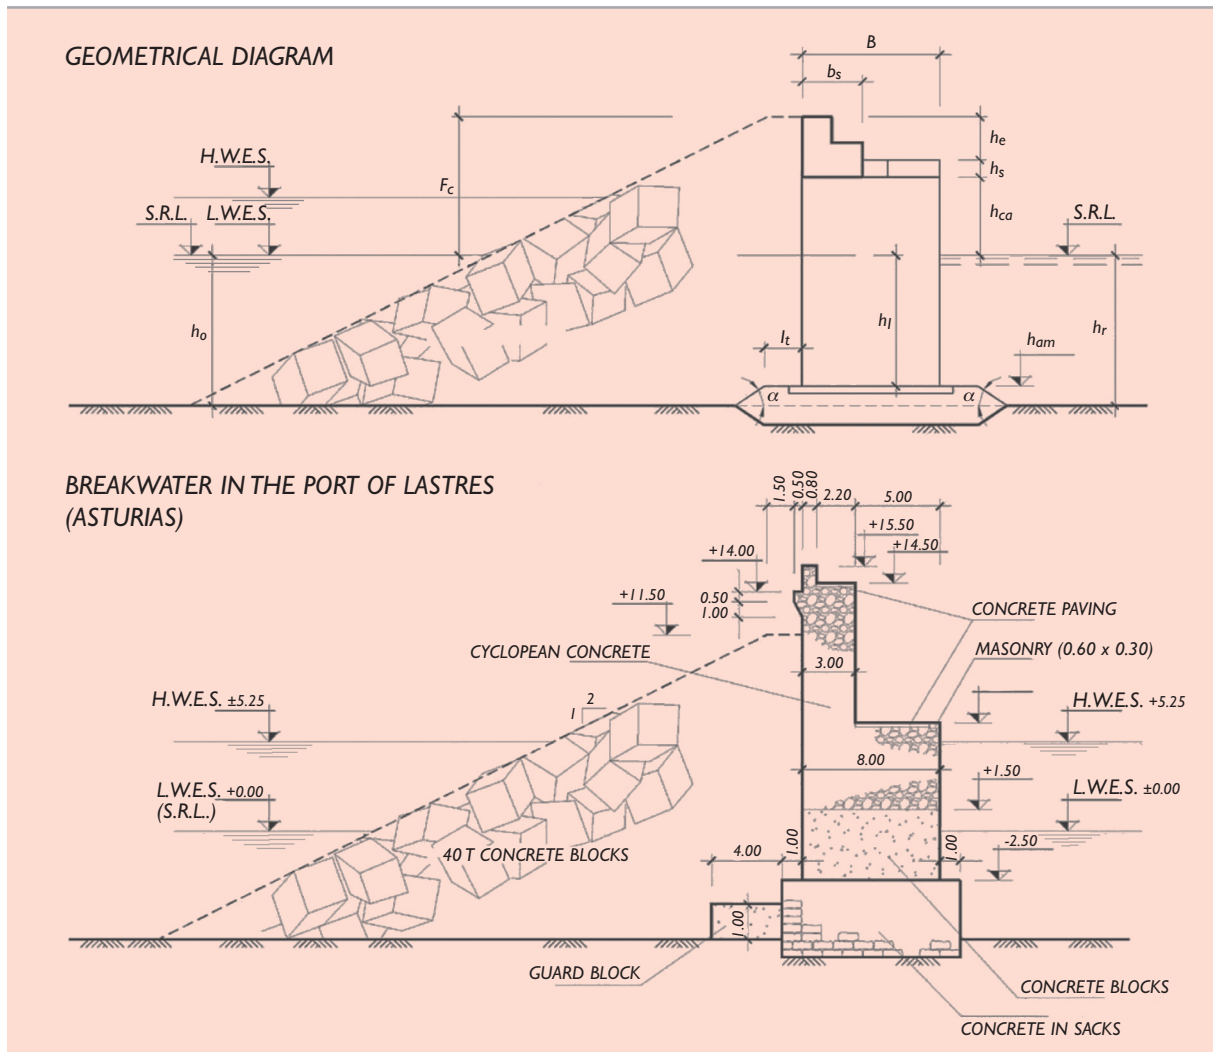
shows a vertical breakwater protected by a slope of armor units material. In this case the central portion or subset is formed by two structural elements: the slope made of concrete blocks and the vertical wall. Both structural elements generally extend above the water. In this case the vertical wall is also part of the superstructure. The presence of the slope transforms the reflecting breakwater into a partially reflecting and dissipative breakwater. The predominance of one action over the other depends on the characteristics of the incident wave, and the geometrical dimensions of the slope. Since there is an impermeable wall behind the granular slope, the level of reflection in this section and the stability conditions of the layer components are different from those of a rubble mound breakwater with a central portion made of quarry run material (see figure 2.2.11).
